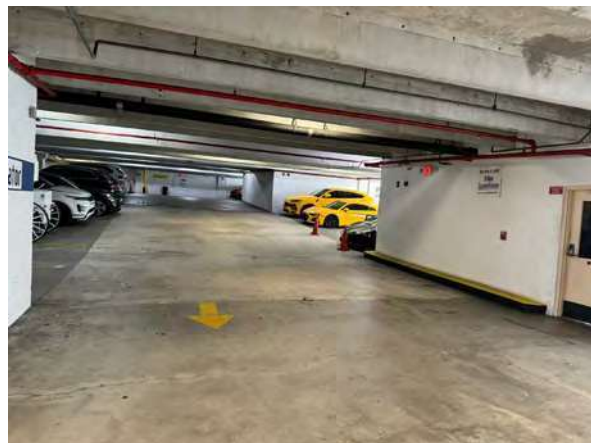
1<sup>st</sup> Level Ramp & Parking
